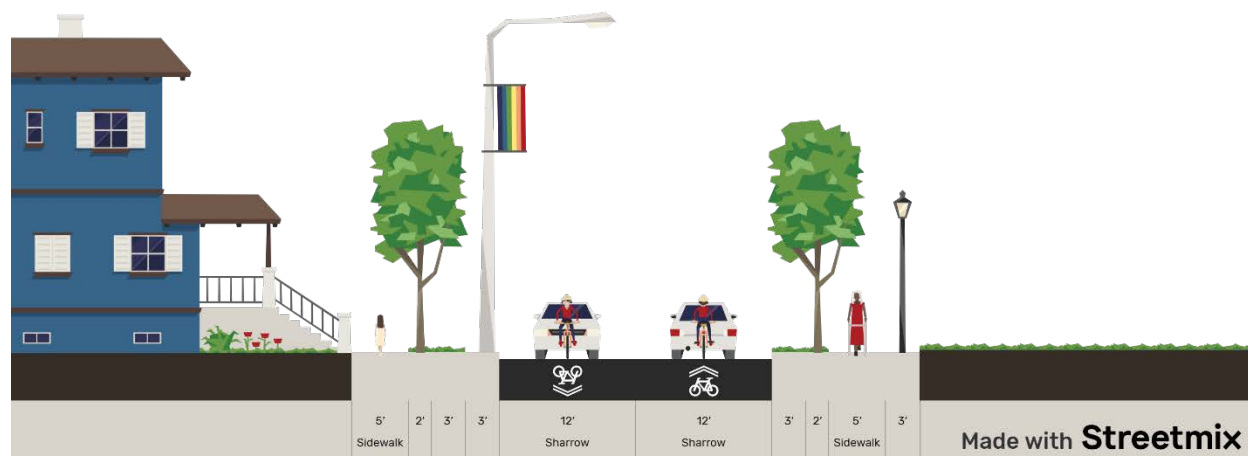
This is a proposed street section of Ott St that faces south. The proposed street design includes a shared bike lane for bicyclists on the driving lane with Sharrow marking. To improve safety and visibility at night, streetlights will be added on both sides of the street, creating a safer environment and enhancing the park atmosphere.
